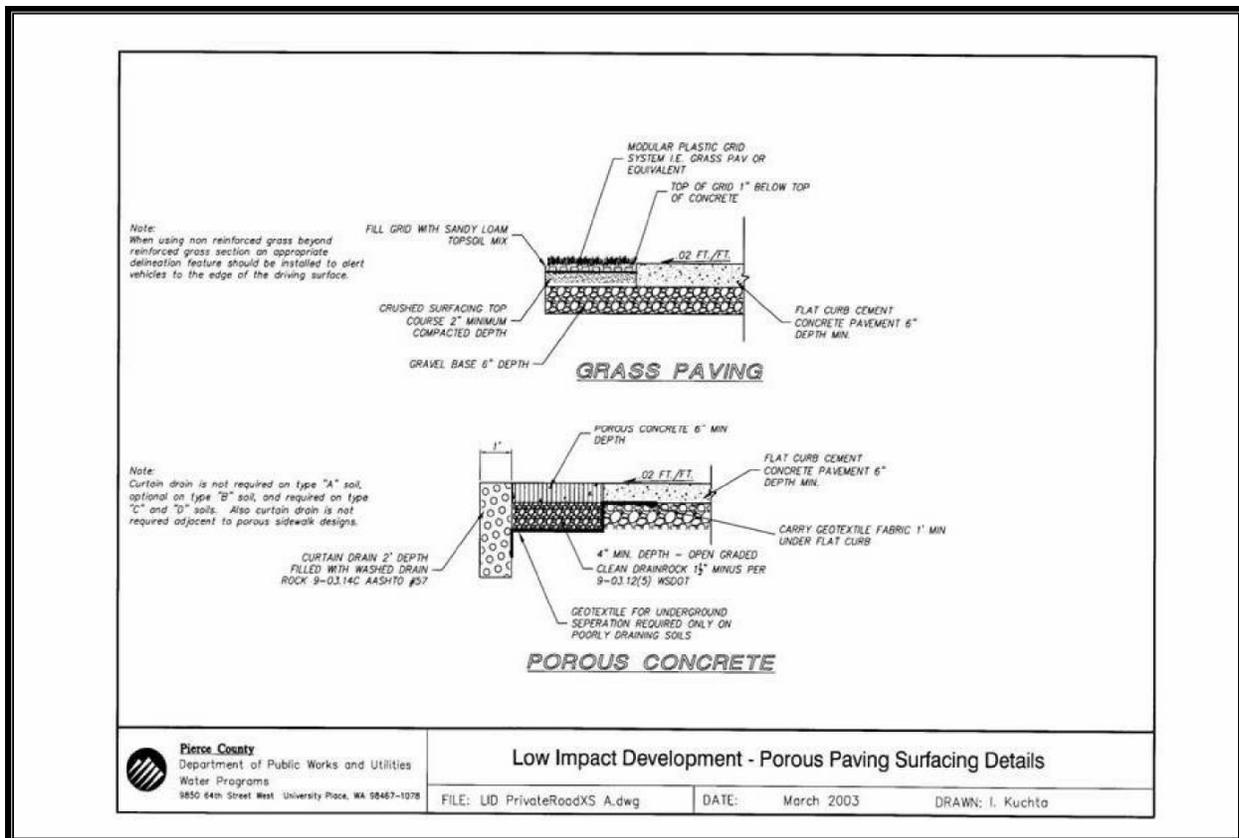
Typical Permeable Pavement Details (source: Pierce County)
